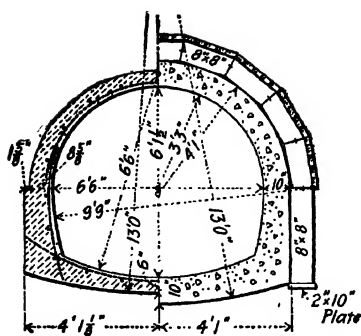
Louisville, Ky., 34th St. Outlet Sewer, 1909, J. B. F. Breed, Chief Engineer. Horseshoe section, 7 ft. by 6 ft. 8 in. Maximum cover, about 25 ft.; average, about 10 ft. Excavation largely in sand, gravel, and clayey loam with some loose rocks. Interior of sewer below springing line lined with vitrified brick. Structure built for considerable distance on Simplex concrete piles.
